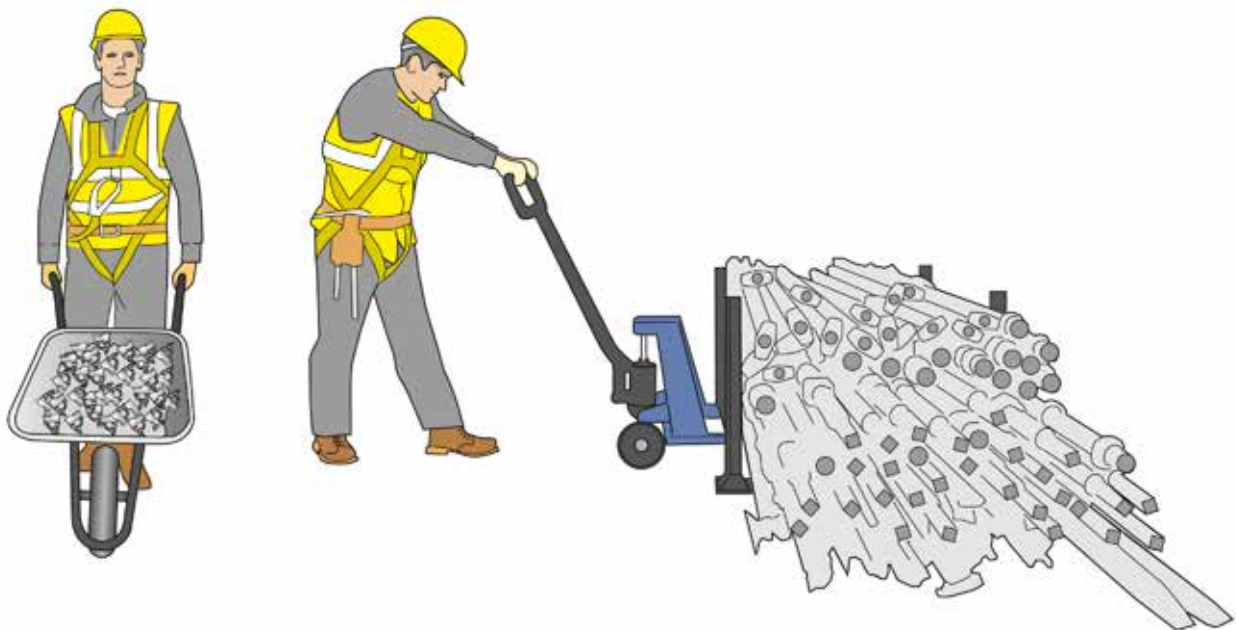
Pallet trucks and wheelbarrows are examples of manual handling aids used in scaffolding operations.
